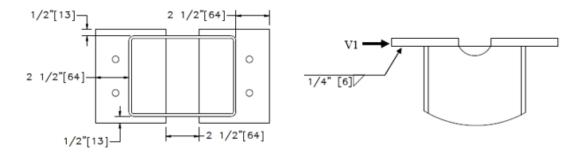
Weld Details and Force Acting on Bottom Base Plate
